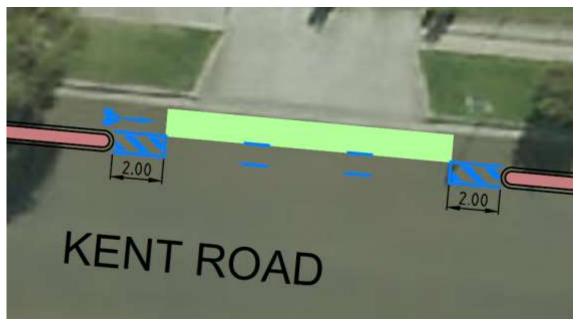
Preliminary concept plan of hatched line marking to improve placement of bins and collection service
